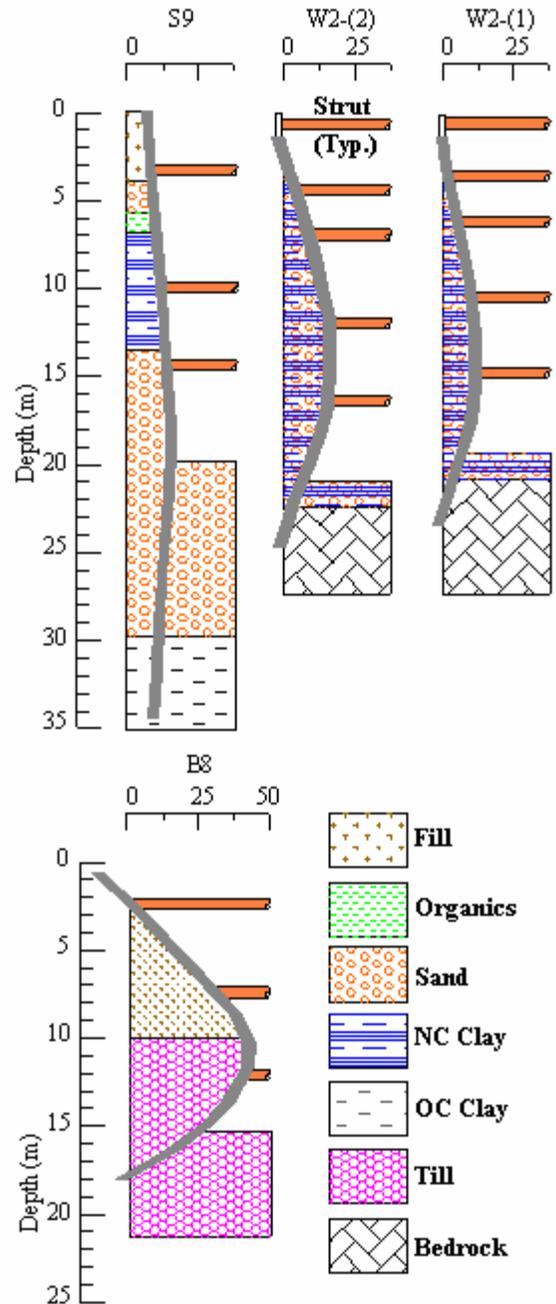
Typical sections and wall deformations  $\delta H$  (mm) of internally braced and cross-lot braced excavations.
